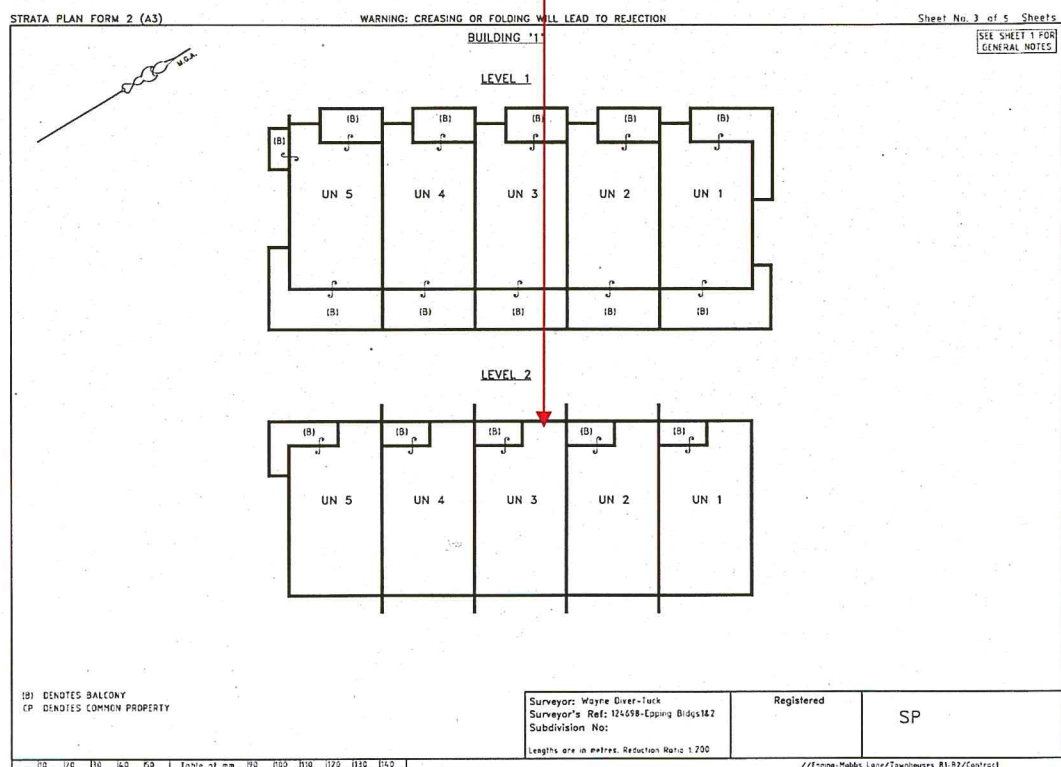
Building '1' Level 1 and Level 2 proposed strata subdivision plan.
